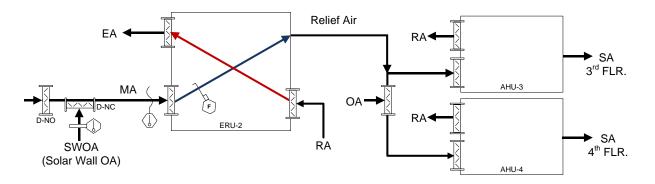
HVAC system diagram for the IDDS solar wall installation.
